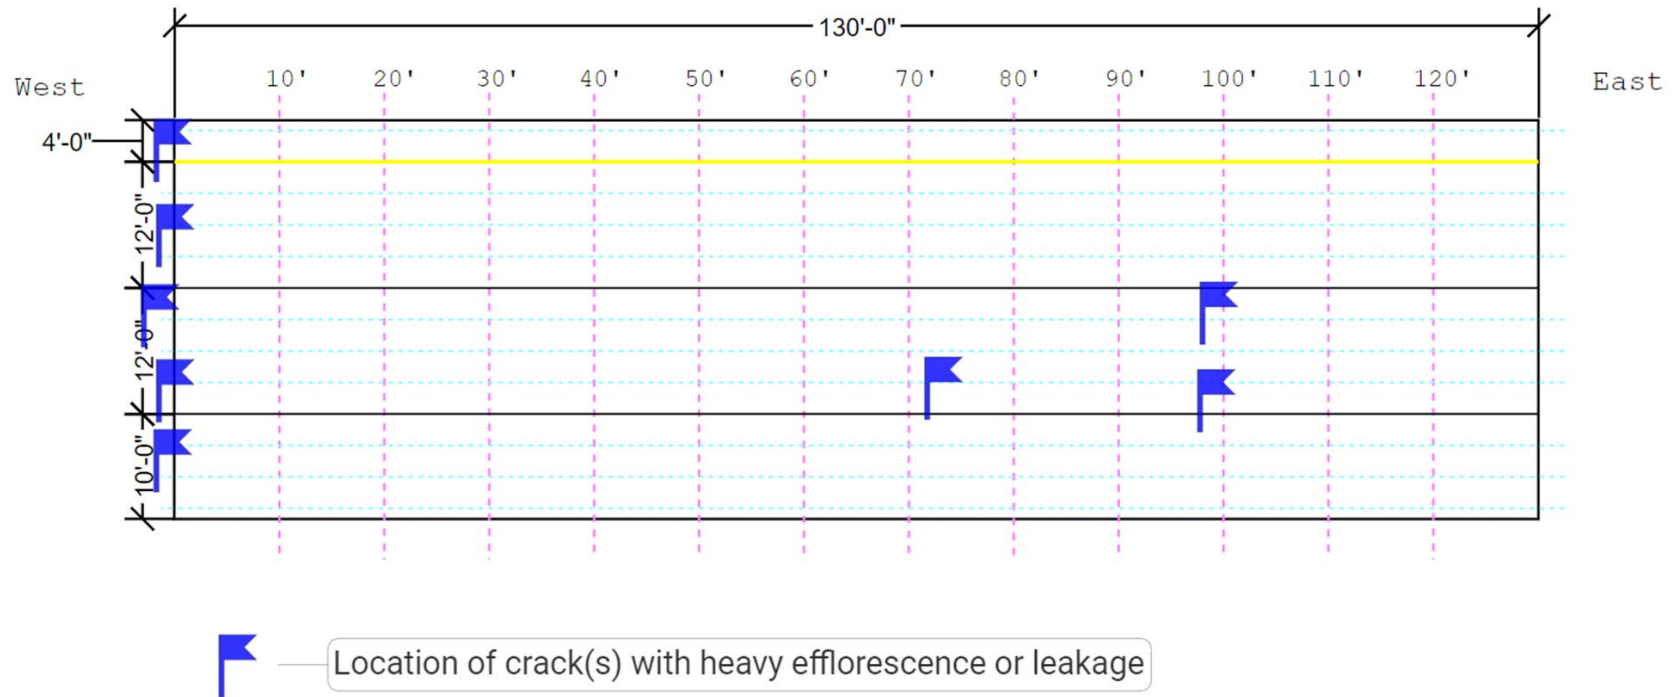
Field notes for Bridge 1374, 2022 inspection, soffit.
